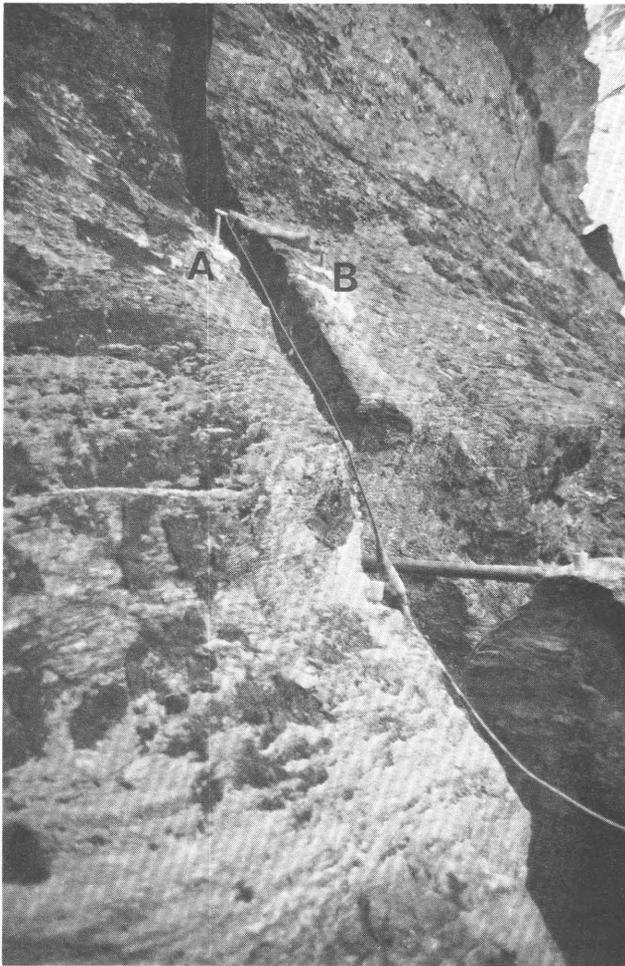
Photograph showing jointmeter installation. Anchors are shown at A and B.
